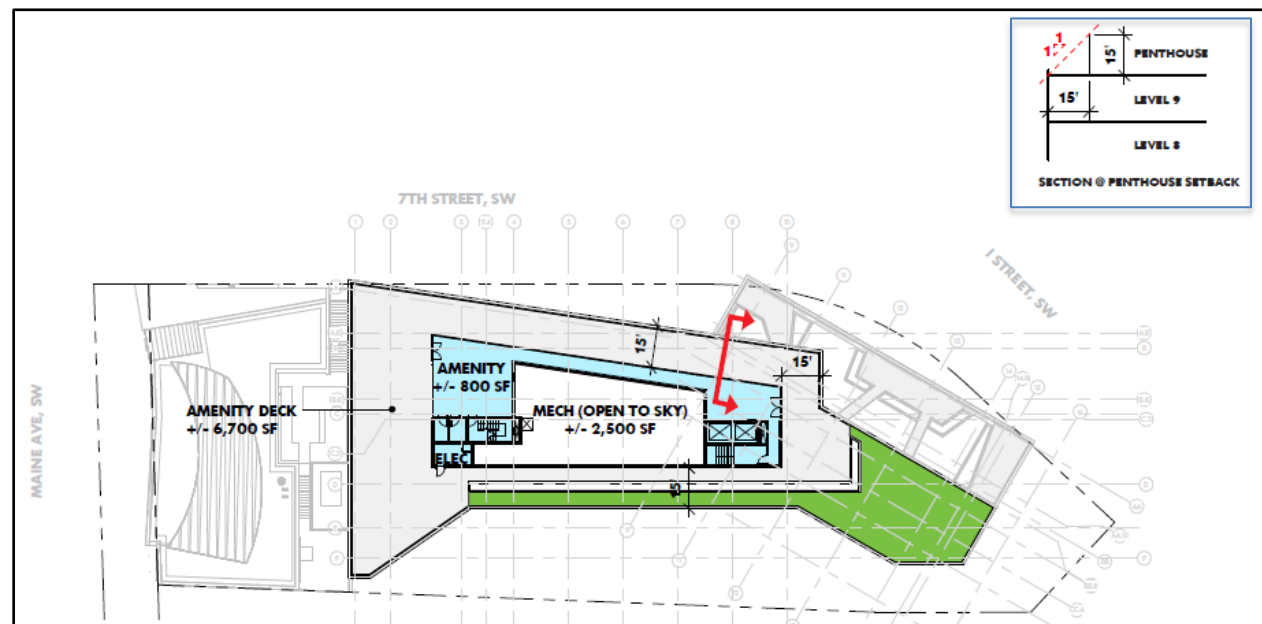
Revised Roof Plan (green roof also atop enclosed amenity and mechanical spaces)
